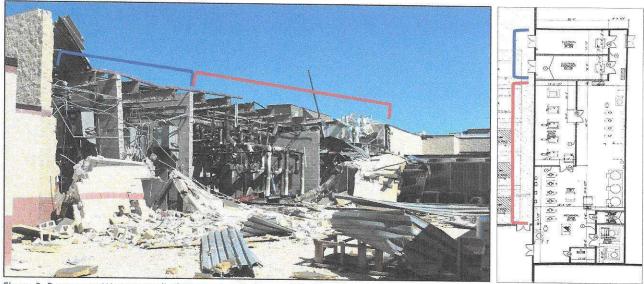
Damage to Western Wall of Mechanical, Boiler, and Electrical Rooms
